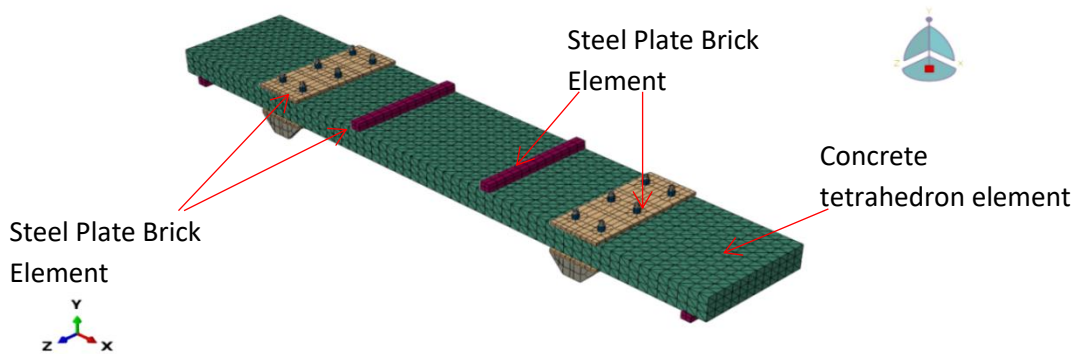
Tetra meshing of strengthening of the cracked bubbled slab.
